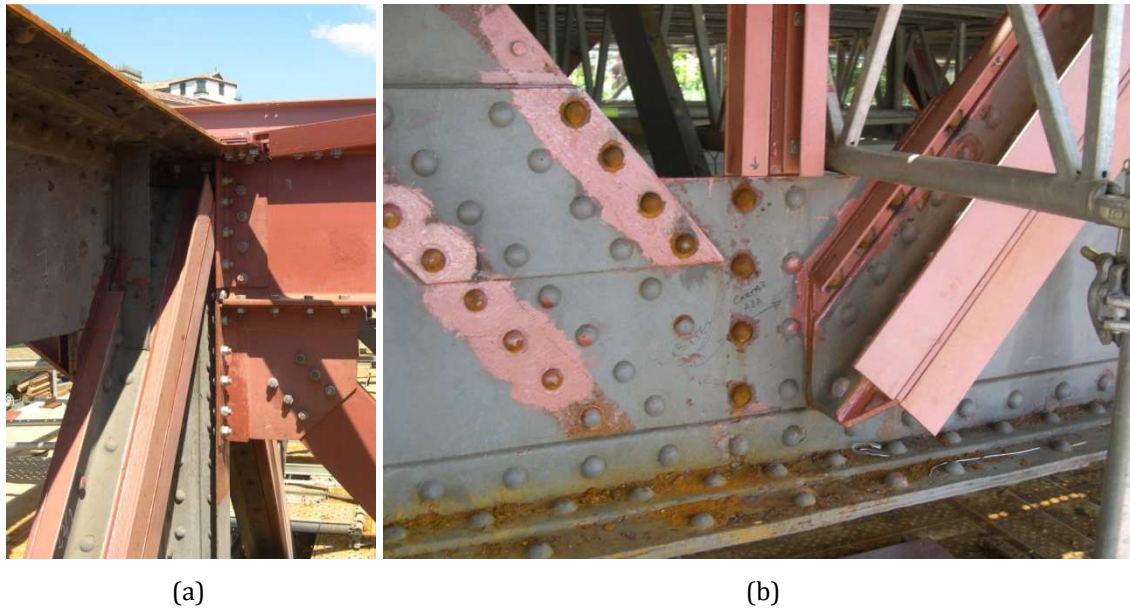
Strengthening of an upper deck diagonal: (a) detailed view of an upper joint over a girder support; (b) detailed view of a lower joint.
